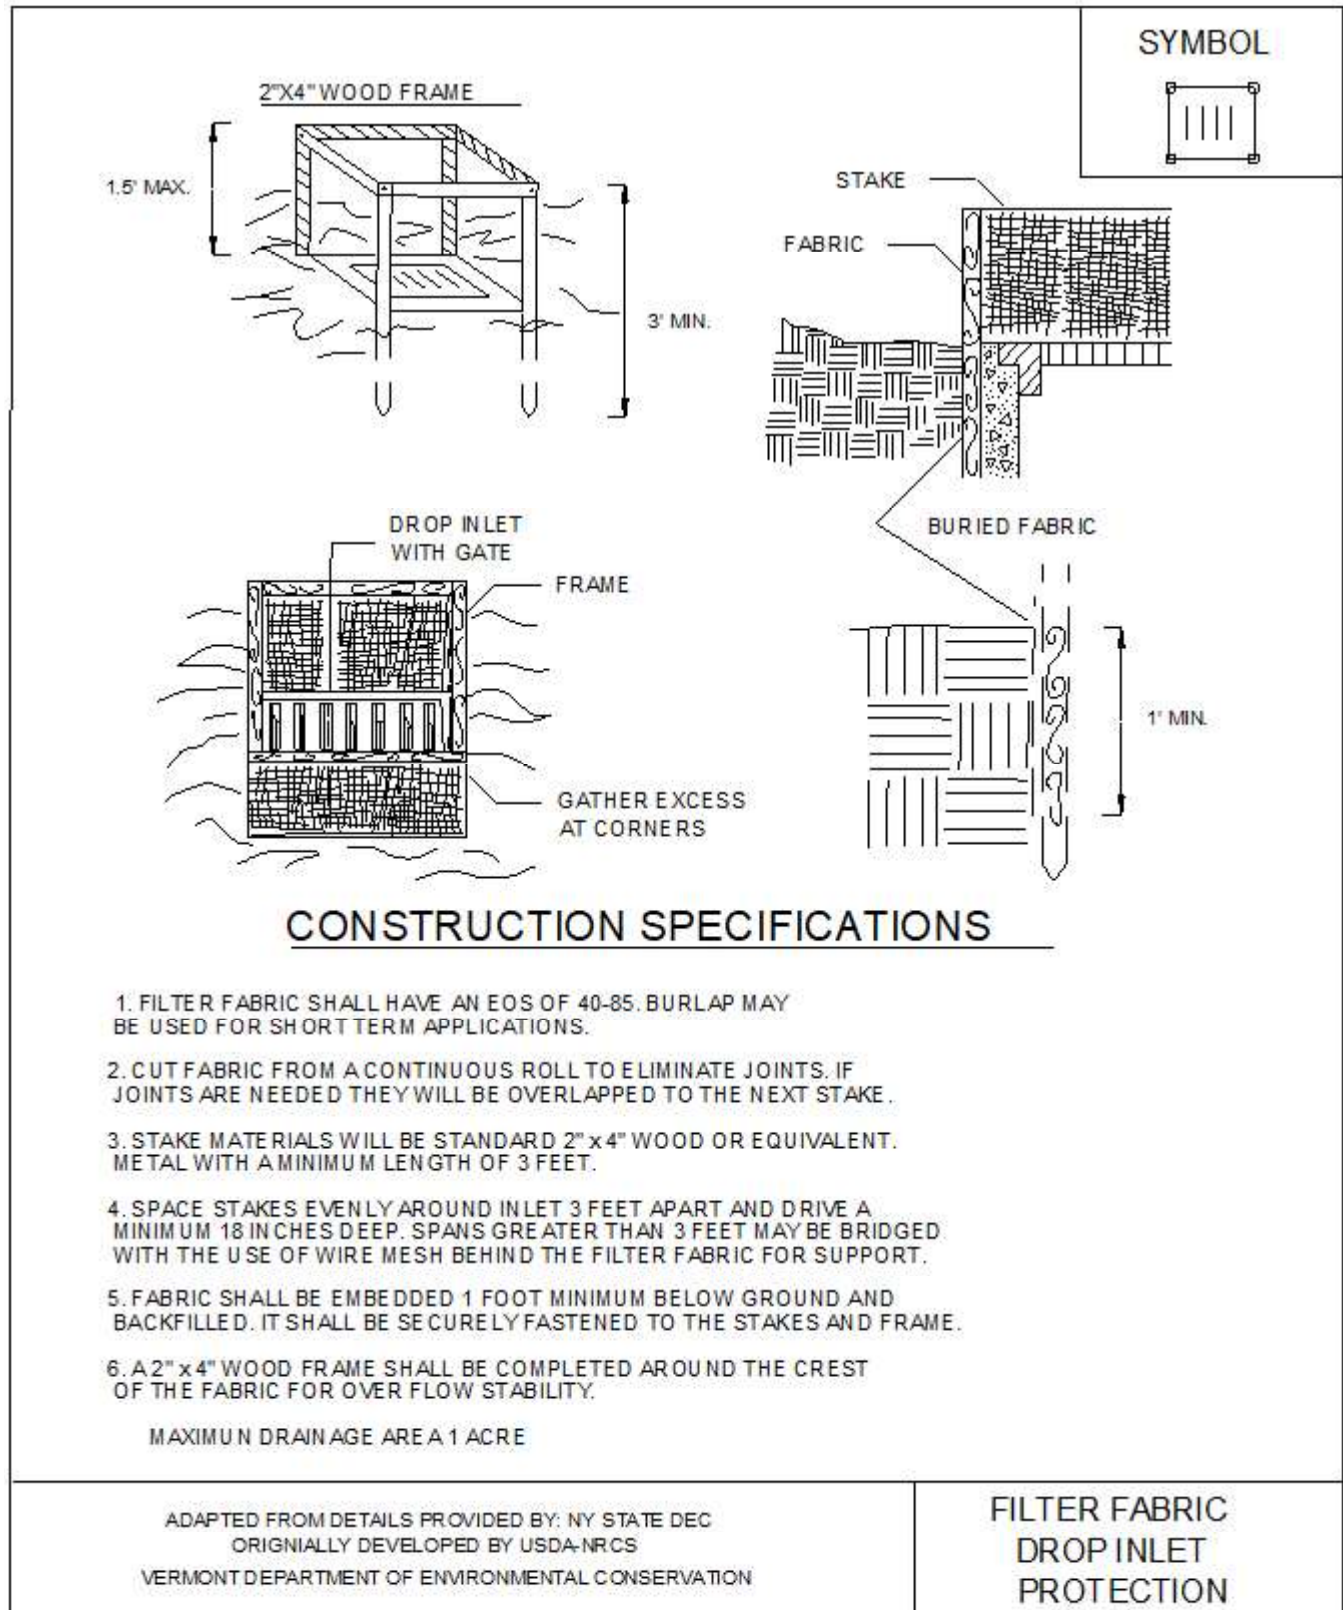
Storm Drain Inlet Protection: Filter Fabric
